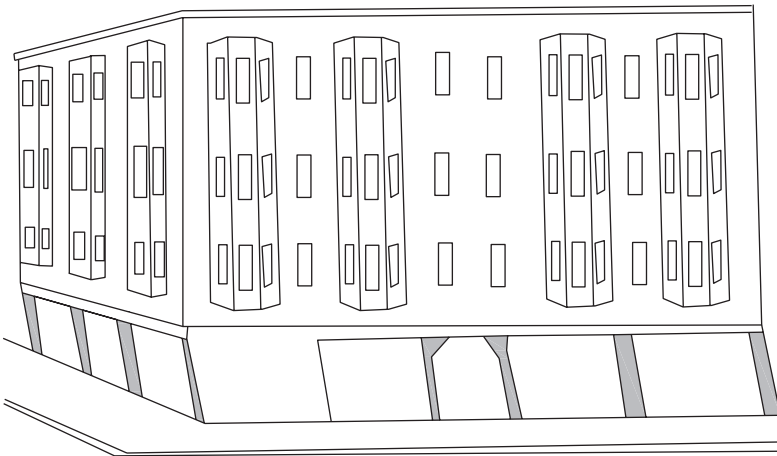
Soft-story collapse: lower story that is weakened by too many openings becomes racked resulting in failure of first-story columns.
